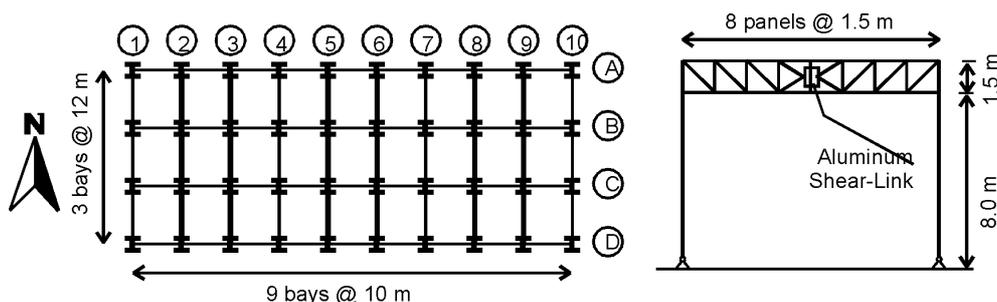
Plan of the study building and elevation of a typical bay in the N-S direction
